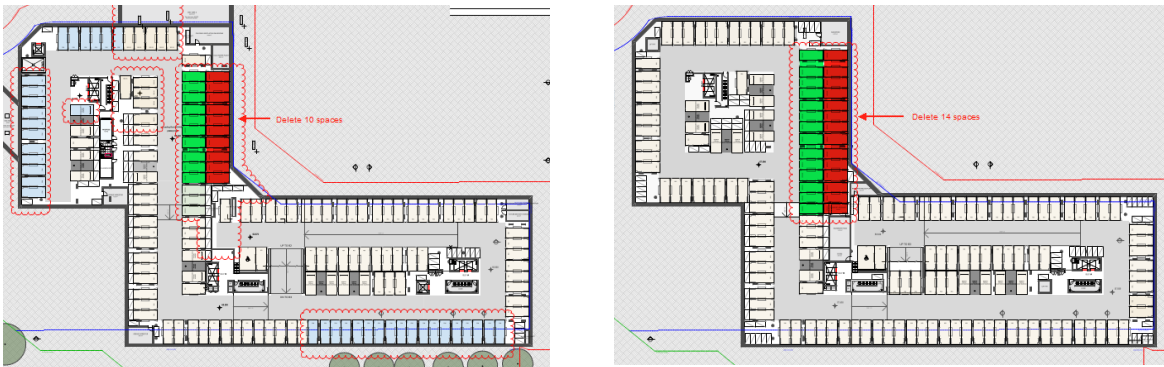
Recommended Morling College tandem parking arrangement (shaded in red and green).
